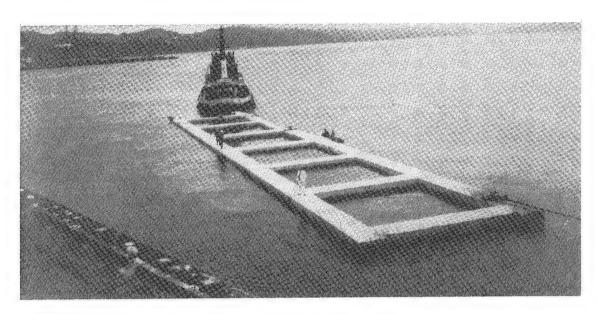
Precast concrete breakwater unit being towed to location at Chaffers Marina, New Zealand (from New Zealand Concrete Construction (1993-1994))
